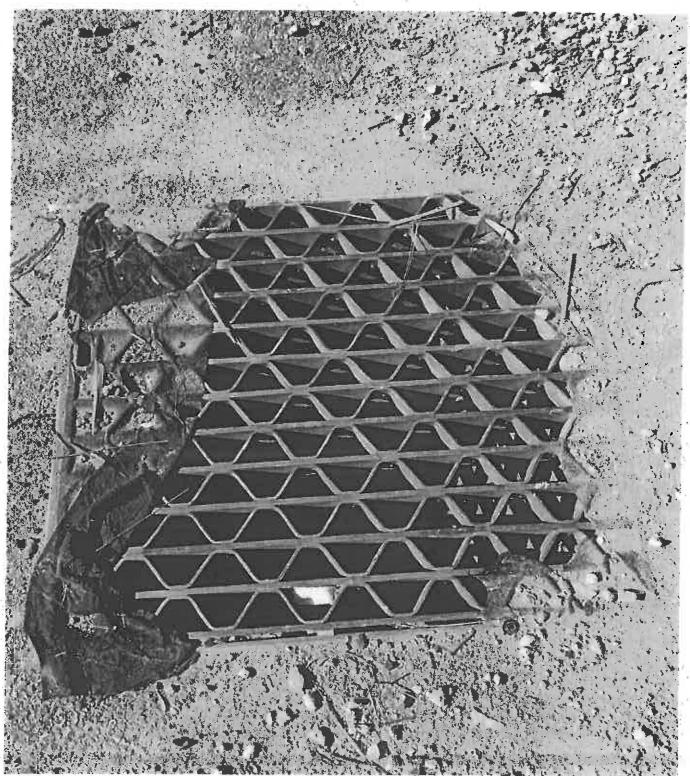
Exposed and unmaintained E and S (Atgrade inlet protection) North of the Site
